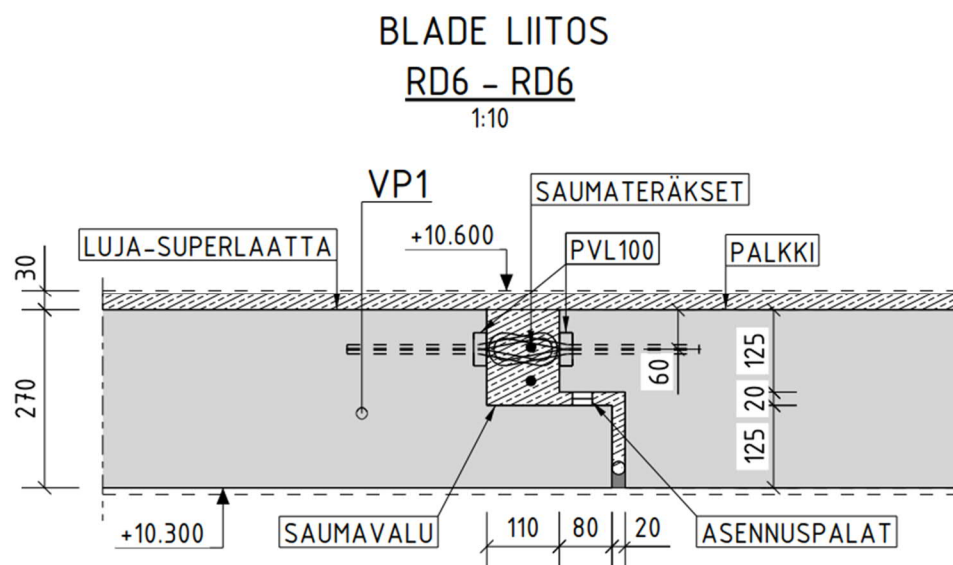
Blade connection: Luja-Superlaatta to precast beam (Tekla Structures drawing snapshot)
